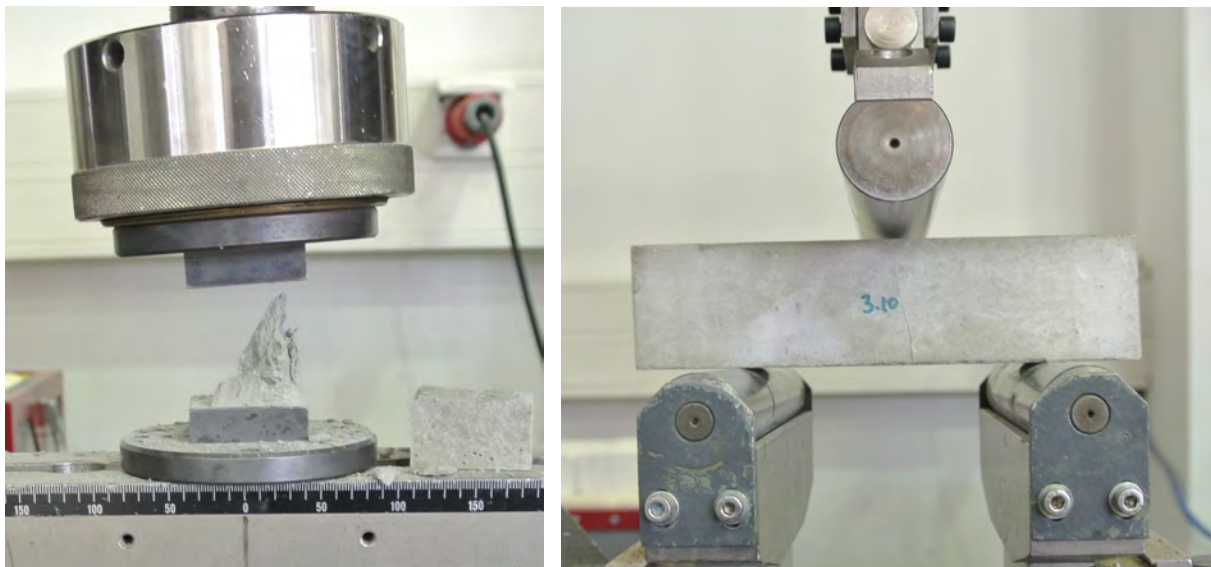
Explosive failure mechanism during the compression strength test of grout 1 and very subtle failure mechanism during the flexural tensile strength test of grout 3.
